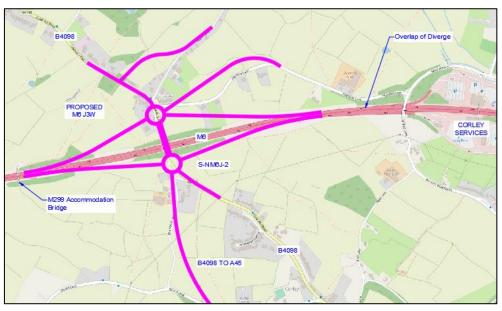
Option 2 M6 J3W at B4098 Sketch
